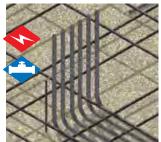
Stiffy Single Loop Slab-on-Grade Trapeze
